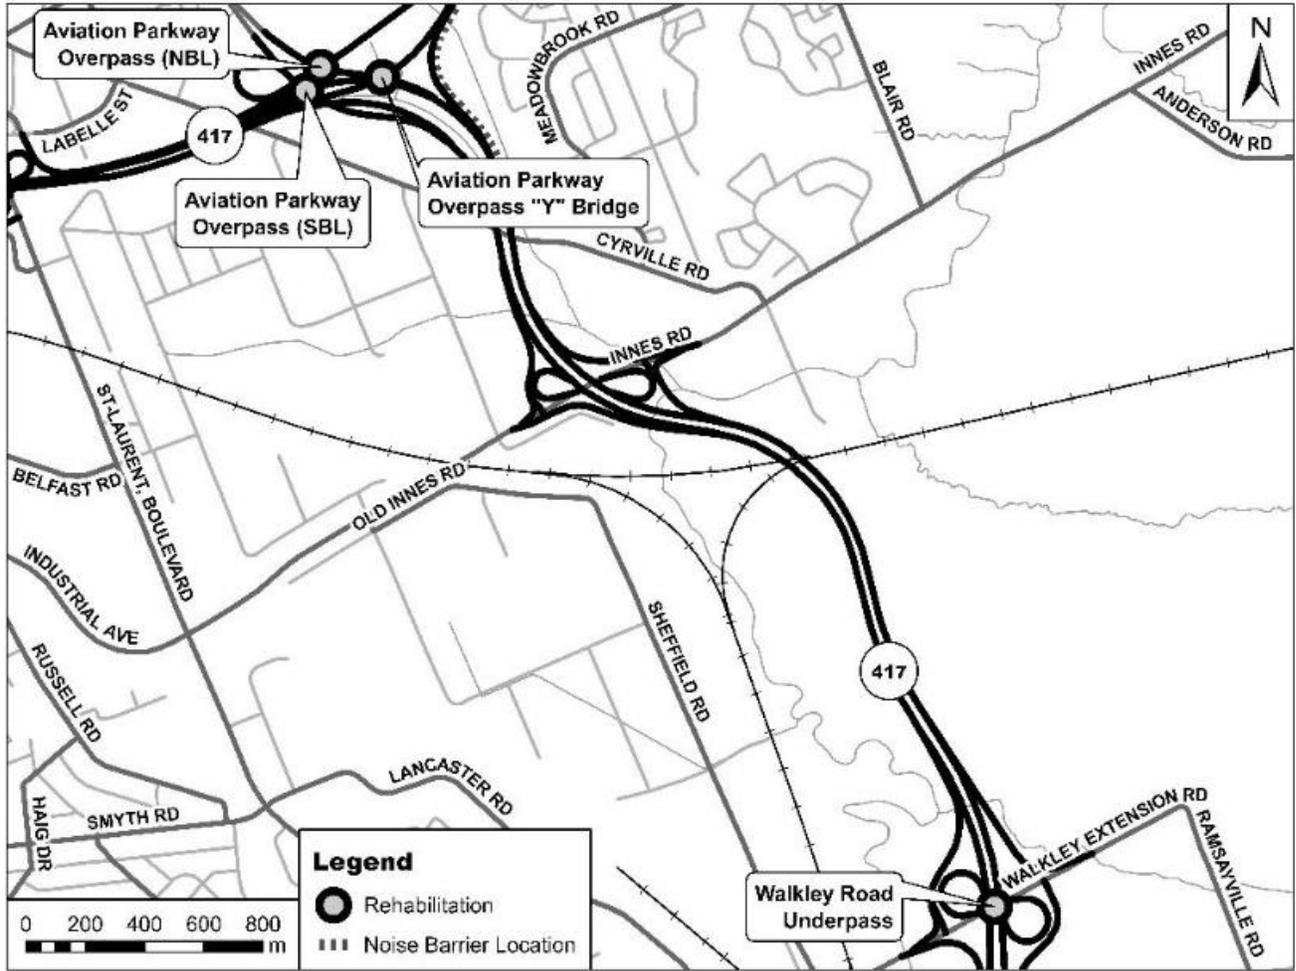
Key Site Plan for Highway 417 Bridges at Aviation Parkway and Walkley Road
